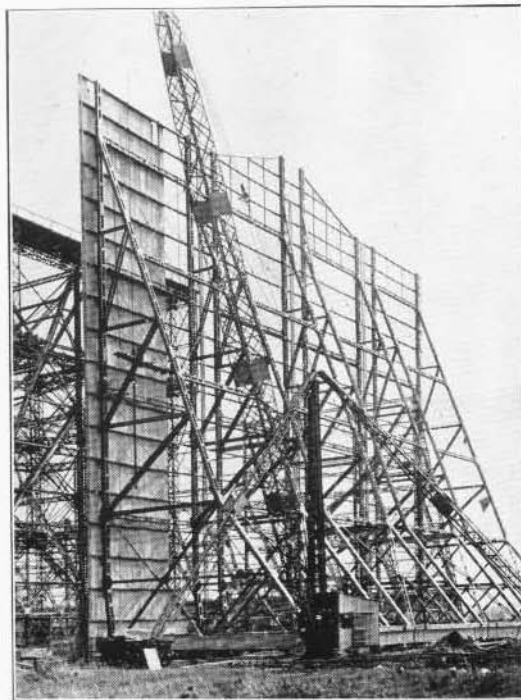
Five tons Jib Crane and Main Doors in course of erection.
